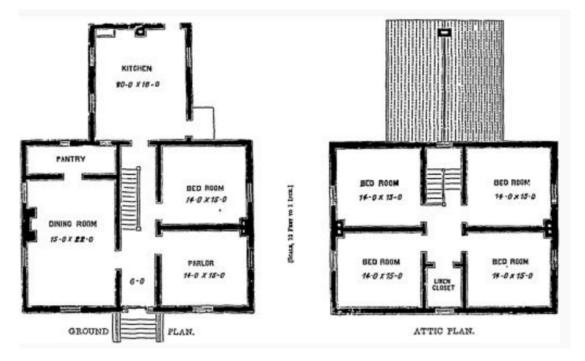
FLOOR PLANS FOR "A CHEAP FARM HOUSE", THE CANADA FARMER, NOVEMBER 15, 1864.
